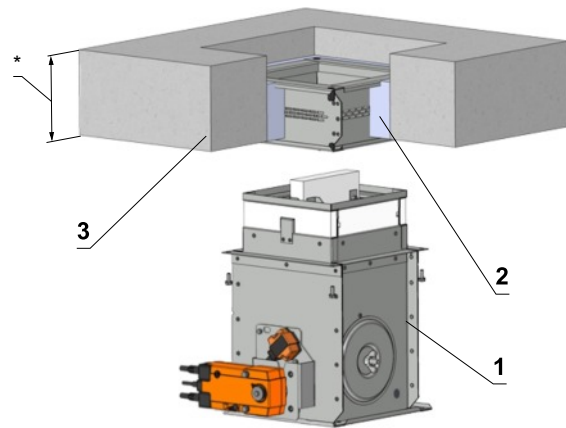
Solid ceiling construction - installation frame E1, E2, E4
